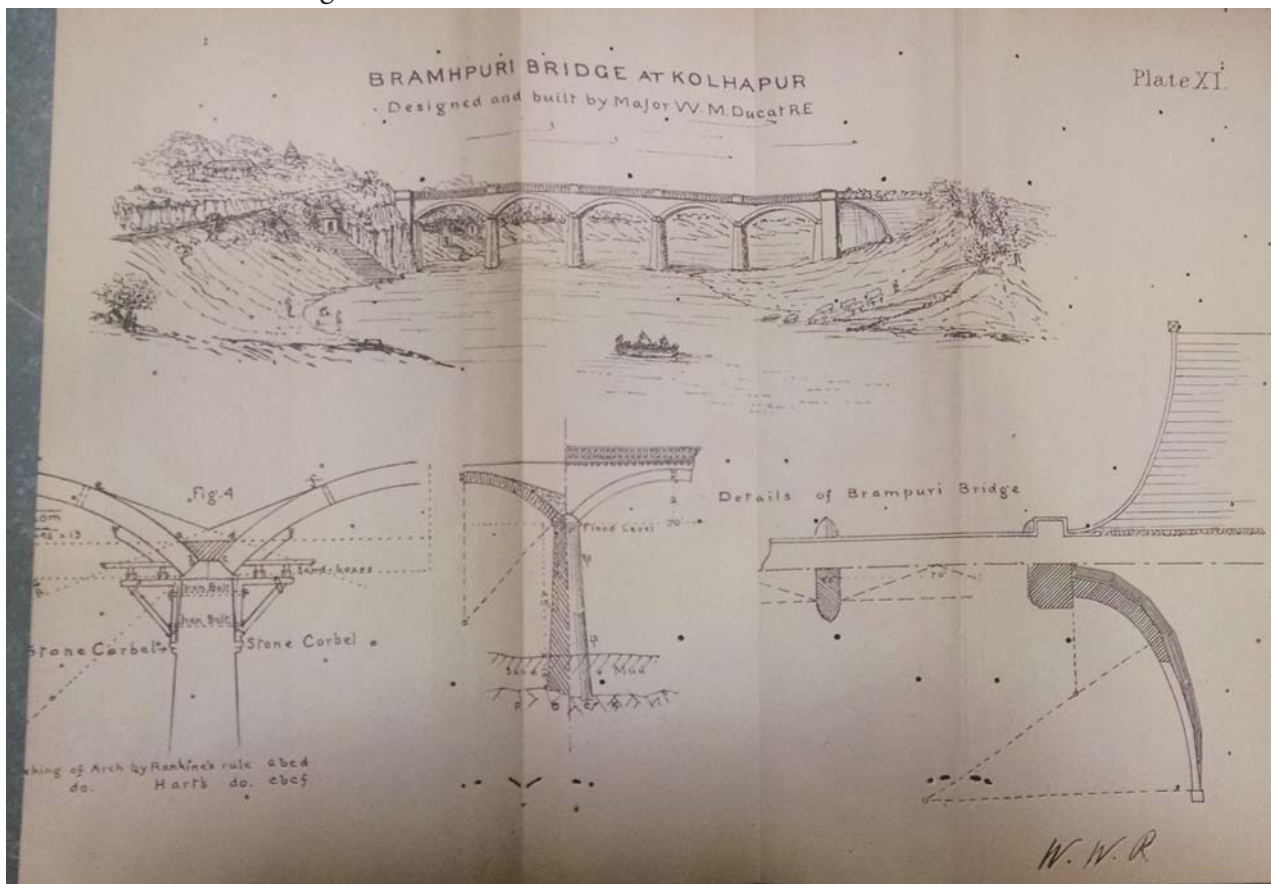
, Bhamhpuri Bridge / Panchganga bridge now known as Shivaji Bridge Kolhapur, Ref: Robinson W.W., "Road Making in Western India",
